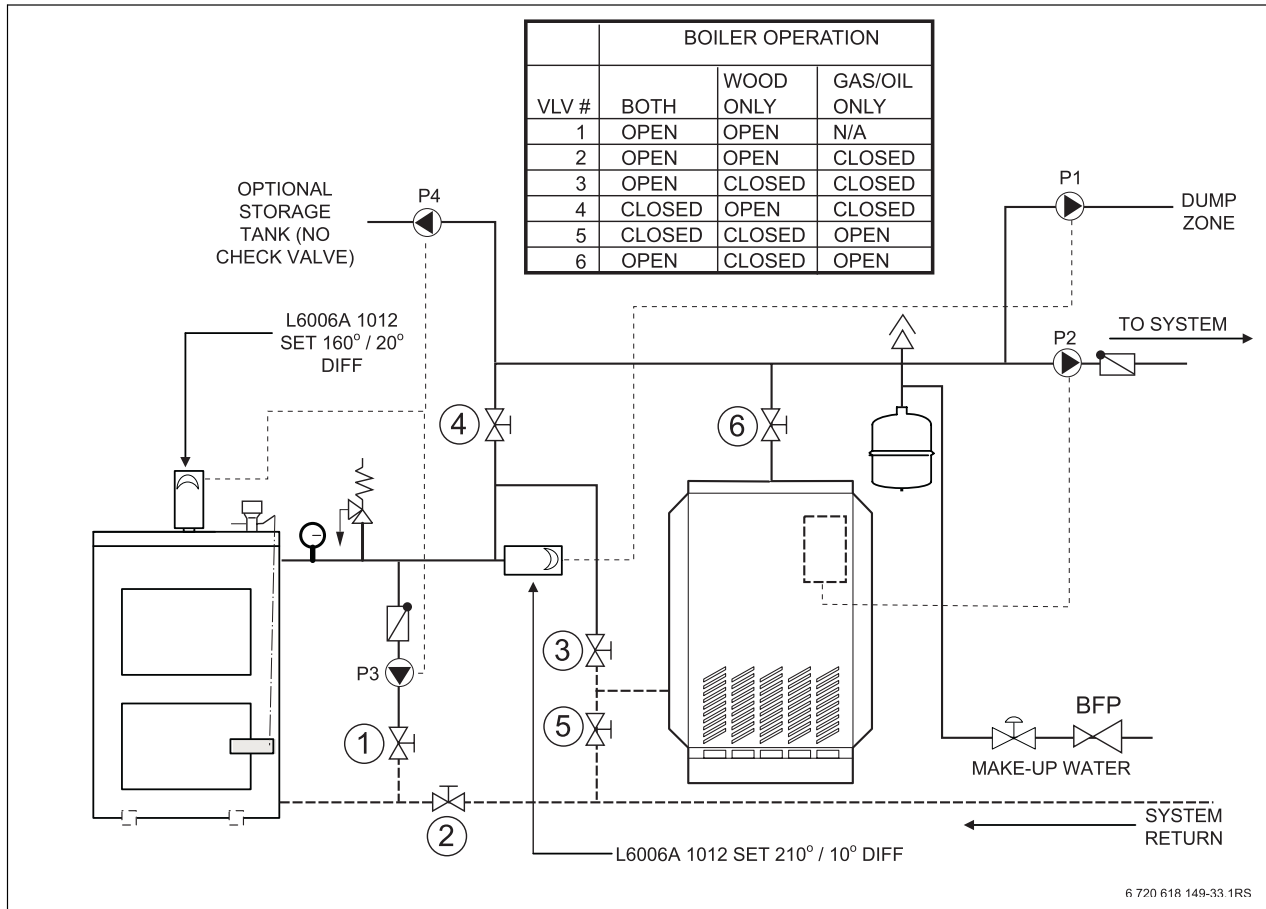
Wood coal boiler with gas/oil boiler (installation example)
